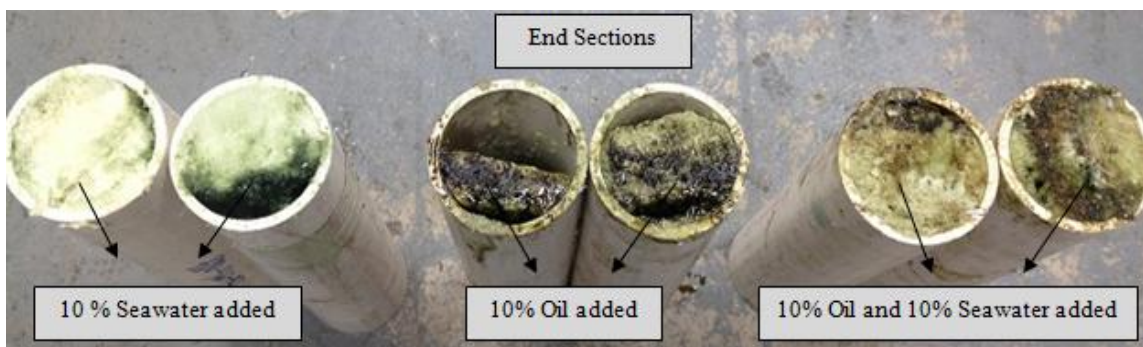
Section of semi-open end of the 3 inch grouted pipes with Grout-5
